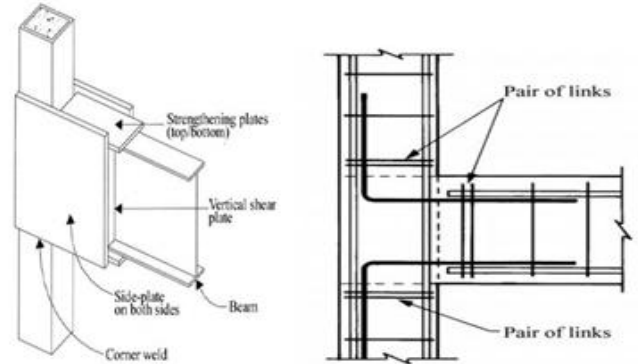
Enhanced beam-to-column connection details for steelwork and reinforced concrete.
